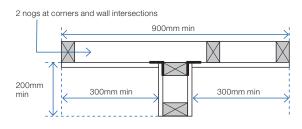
WALL INTERSECTION (GIBFIX® FRAMING SYSTEM)
